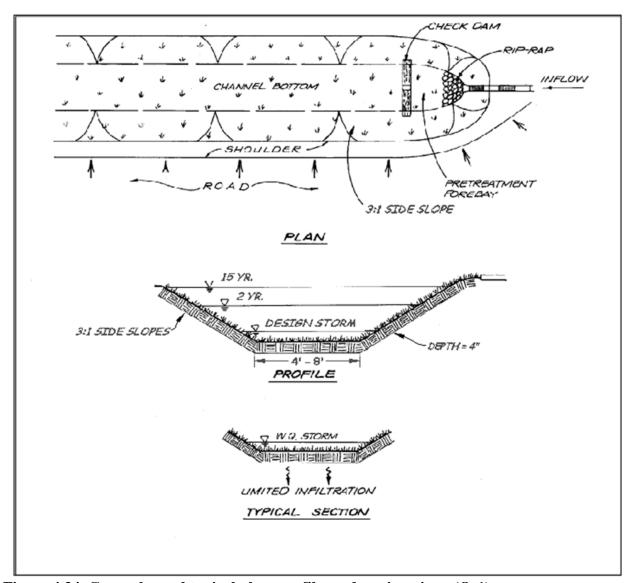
Grass channel typical plan, profile, and section views (O-1).
